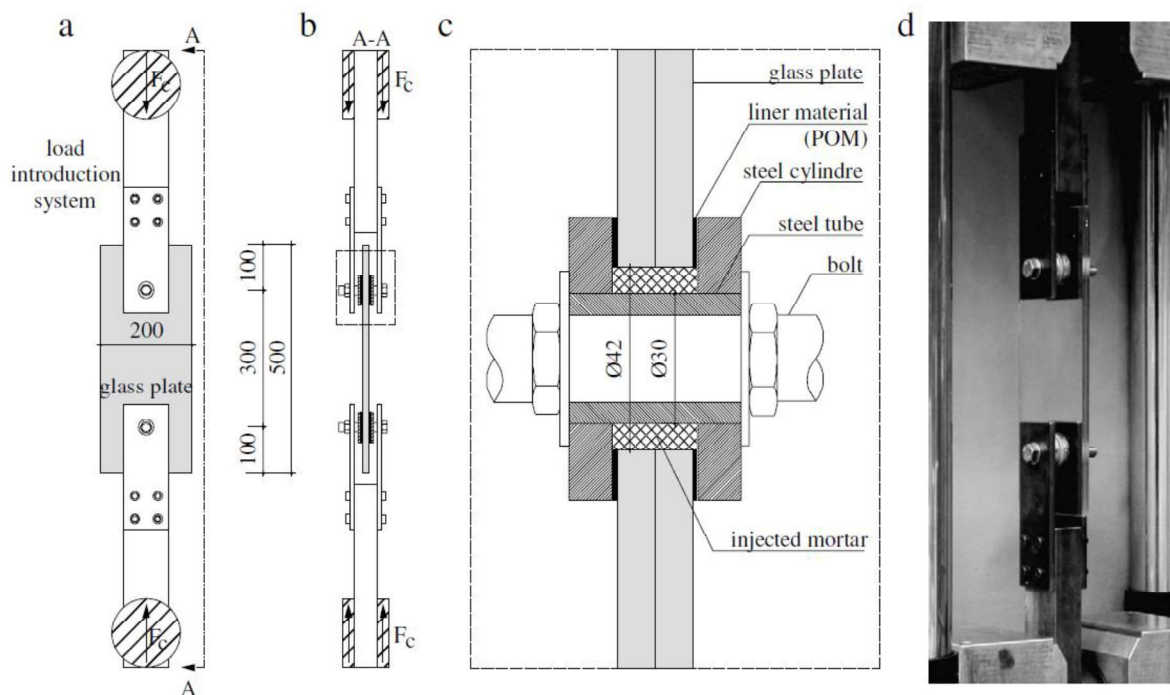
(a) Front view, (b) Side view, (c) connection detail; (d) test specimen in laboratory [4]
